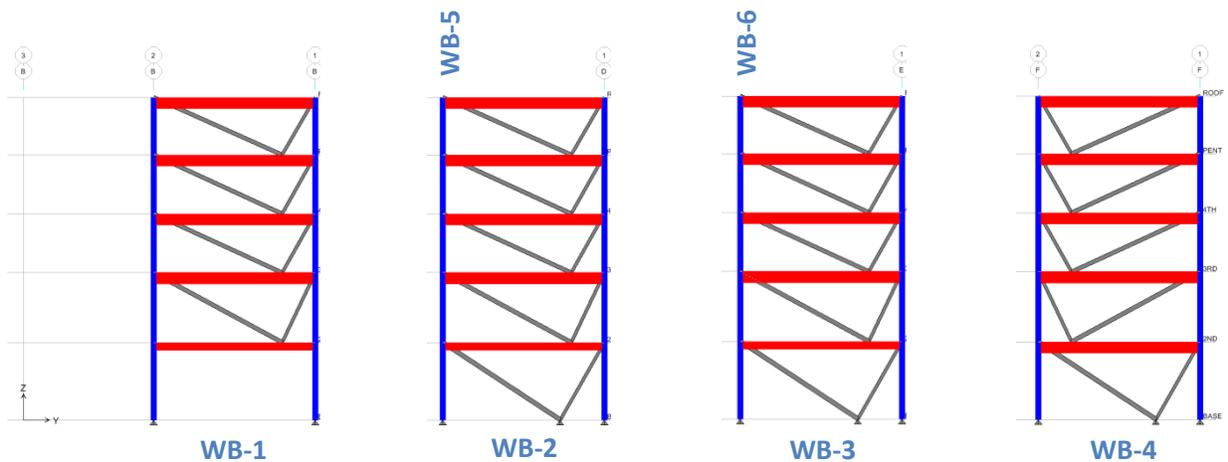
Elevations of braced frames in the Y-Direction modeled in ETABS
